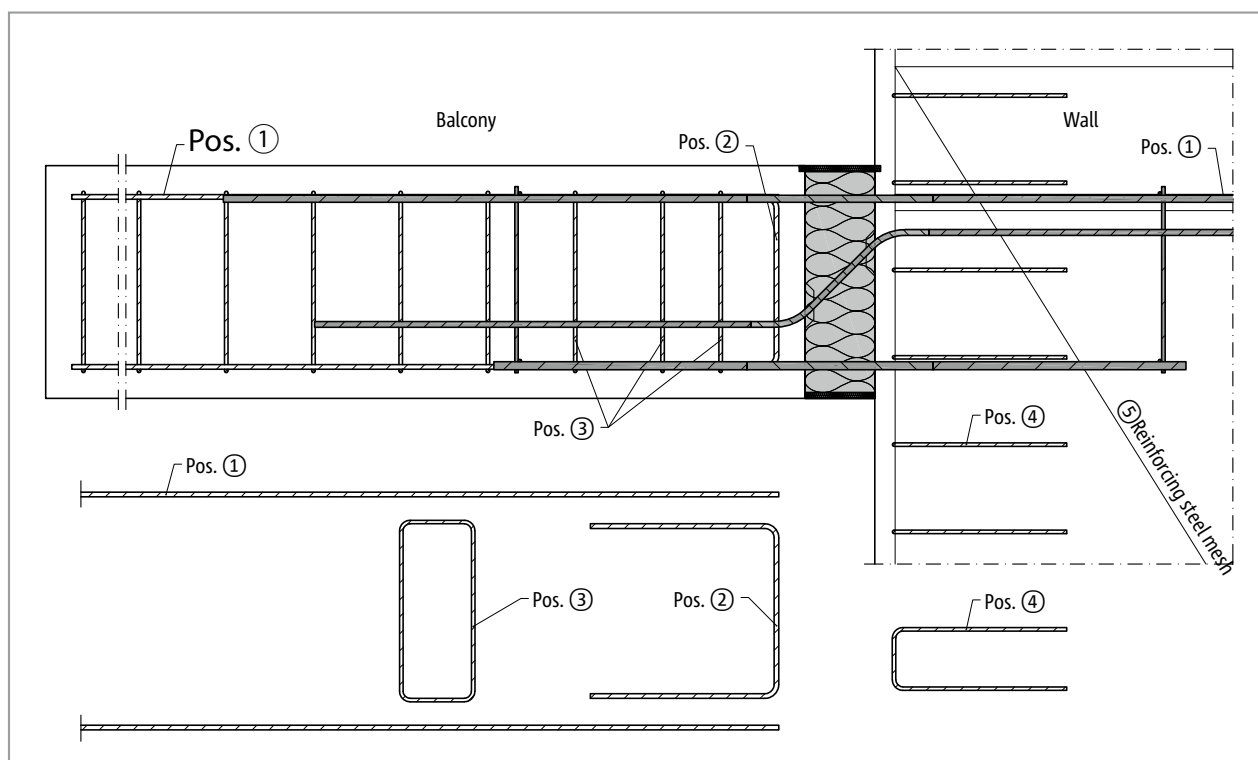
Schöck Isokorb® XT type B: On-site reinforcement
